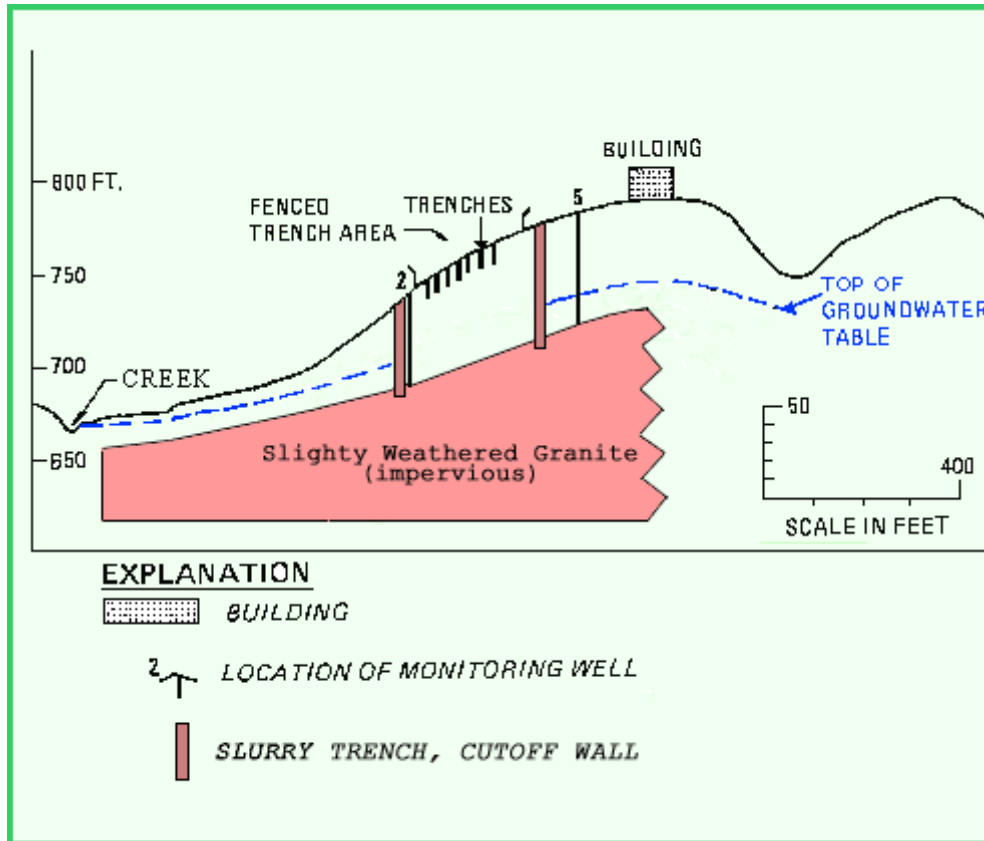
Cross-section showing the Slurry Trench Cutoff Wall anchored in the granite bedrock
